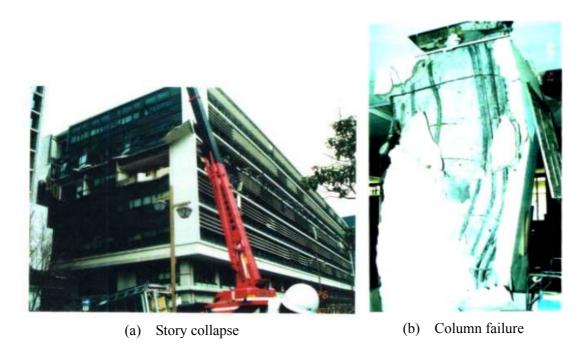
Story collapse at 6th floor and column failure at 5th floor inside of the building
